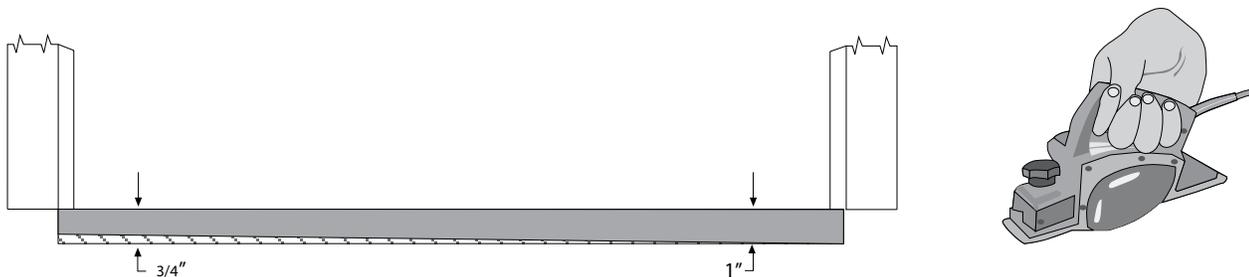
If the surface onto which the ramp is to be installed is irregular or not parallel with the sill or threshold in the opening, the bottom of the ramp can be contoured with a power hand planer to provide a proper fit.
